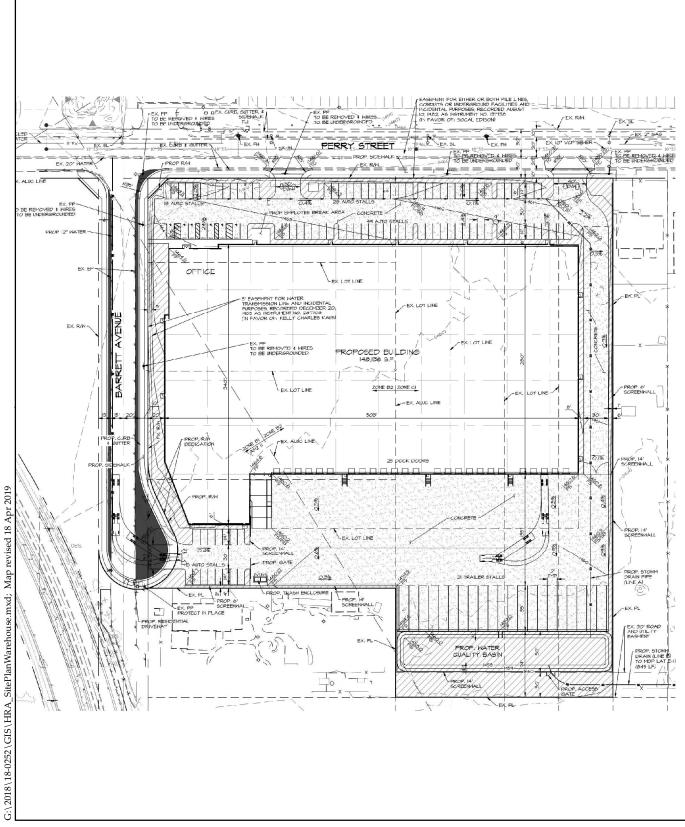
Proposed Site Plan Duke Warehouse at Perry St. and Barrett Ave.
